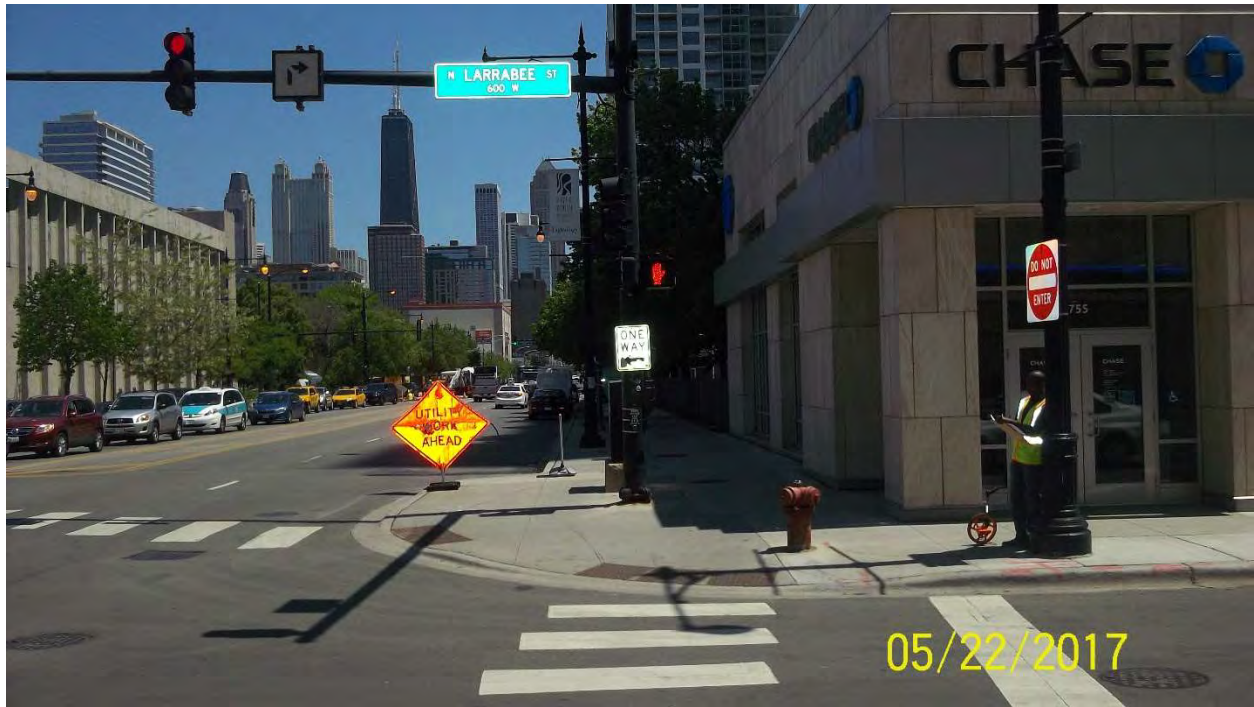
Southwest corner of Chicago Ave. / Larrabee St. – Looking East
